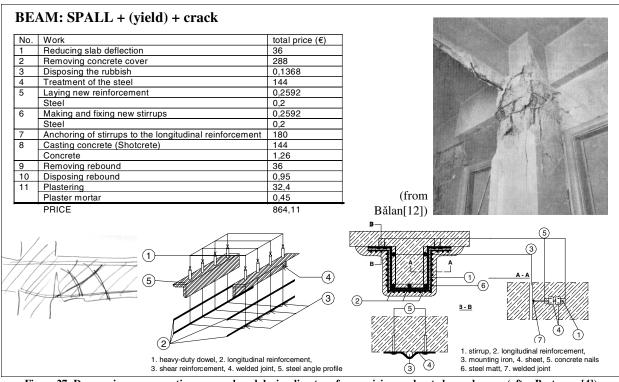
Damage image, reparation approach and device directory for repairing moderate beam damage (after Bostenaru[4])
